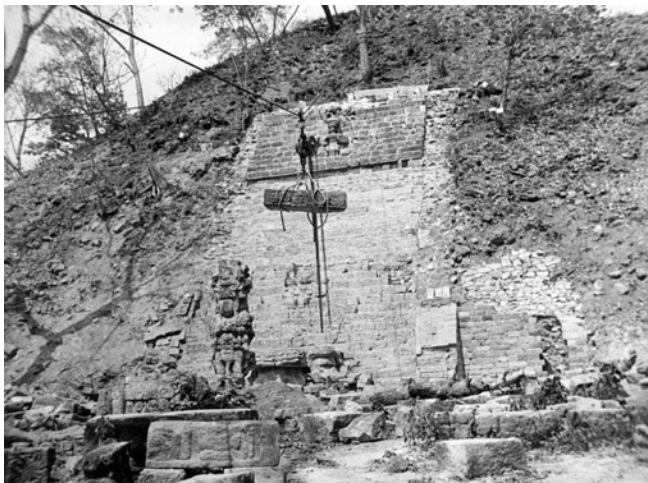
The Hieroglyphic Stairway during the reconstruction. The foundation stairway is built up to step 45, and the section of fallen steps is being placed from step 29 to step 45. 1937.
